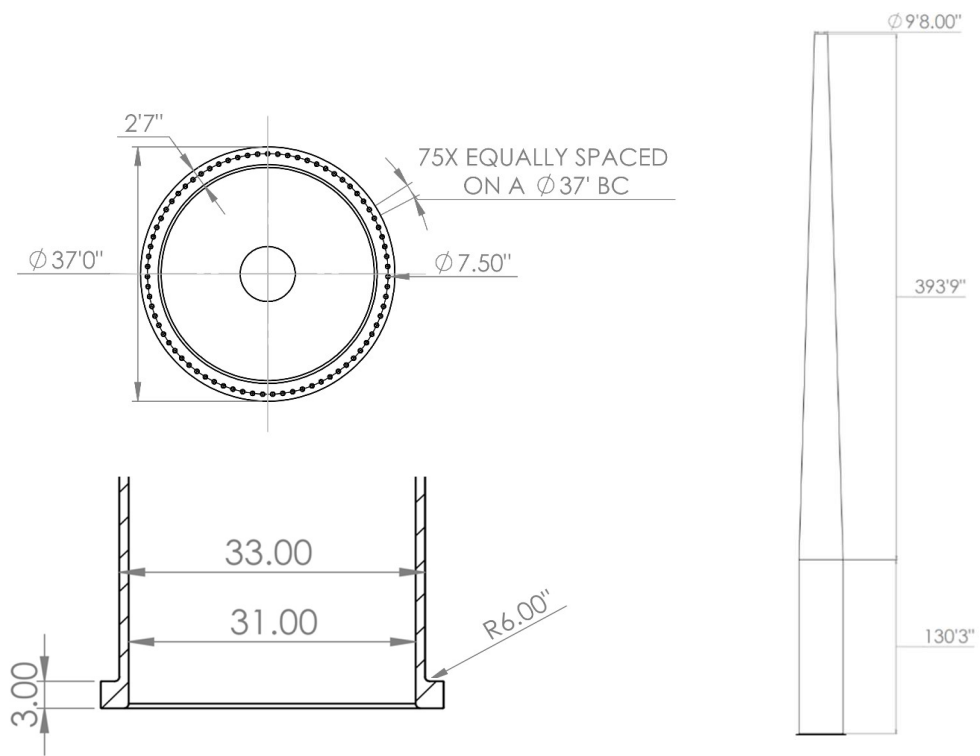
Dimensioned Drawing of Hybrid Cylinder-Taper Tower
